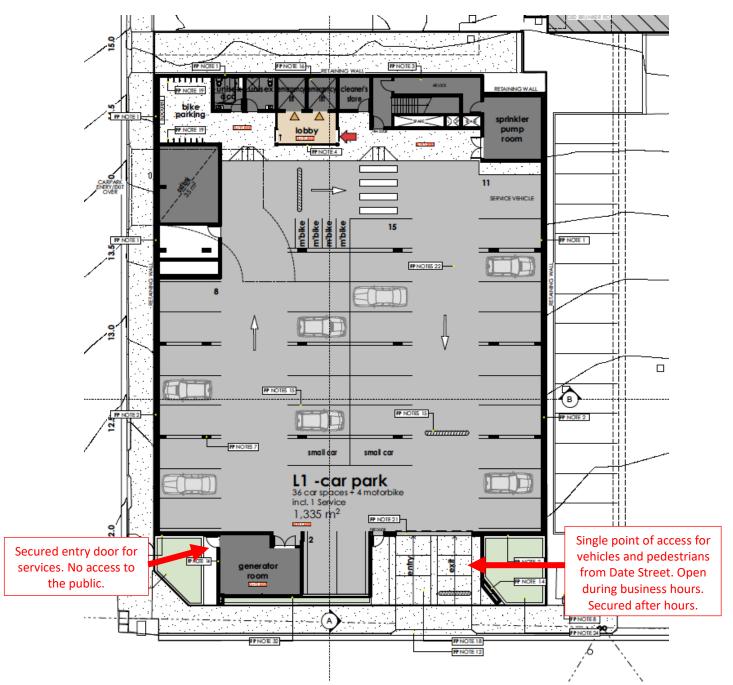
Plan showing vehicular and pedestrian access points – Level 1
